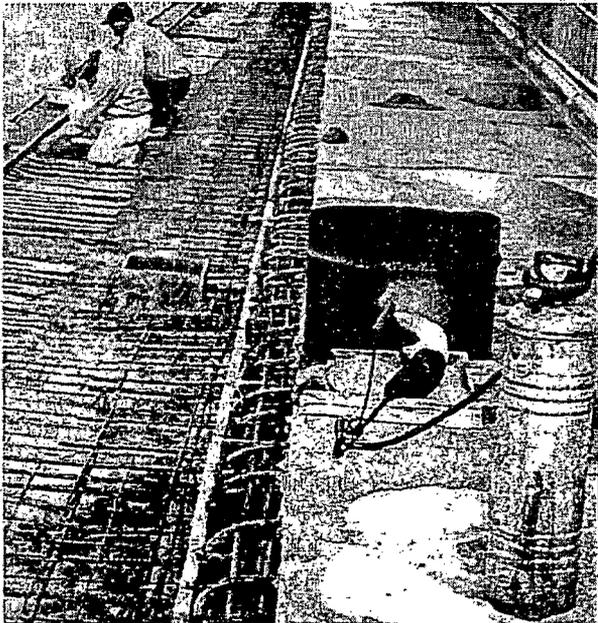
Heating a water bath in which cans of epoxy resin and hardener can be temperature conditioned to facilitate use and proper hardening. In background workmen are brushing on an epoxy grout for bonding new plastic concrete to an old concrete section
